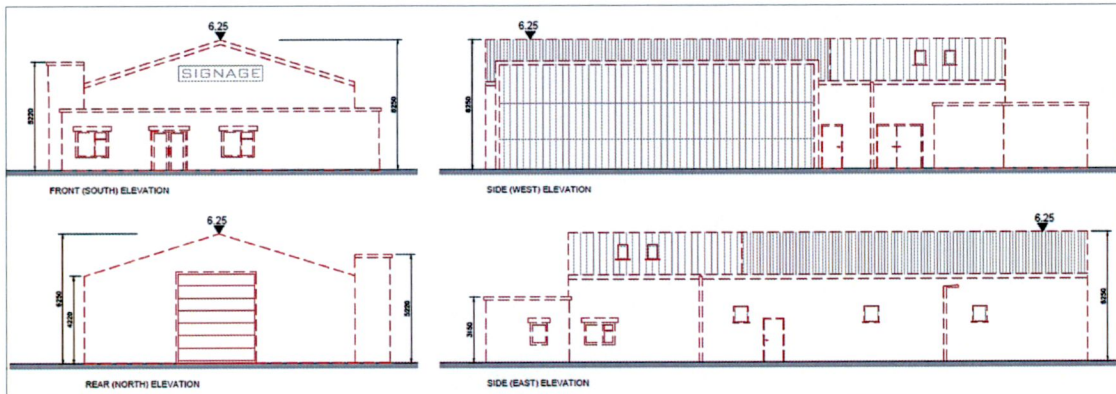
Existing Elevations (Drawing No.: B0125-A-004)
